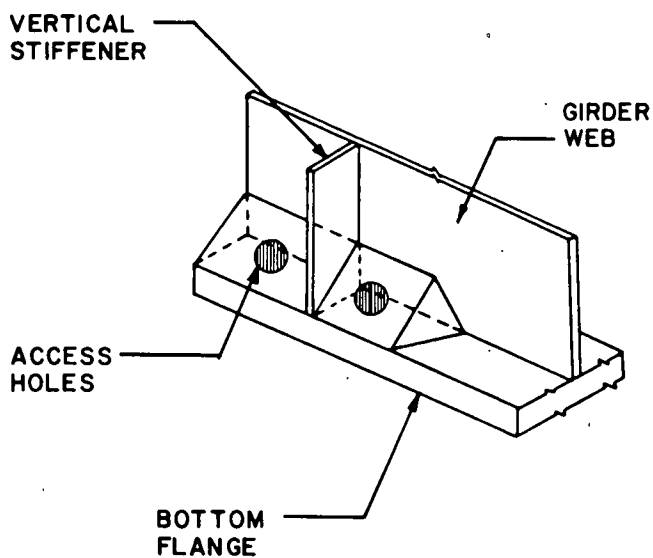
Closed box detail at bearing stiffener. [Yamada 1983]
